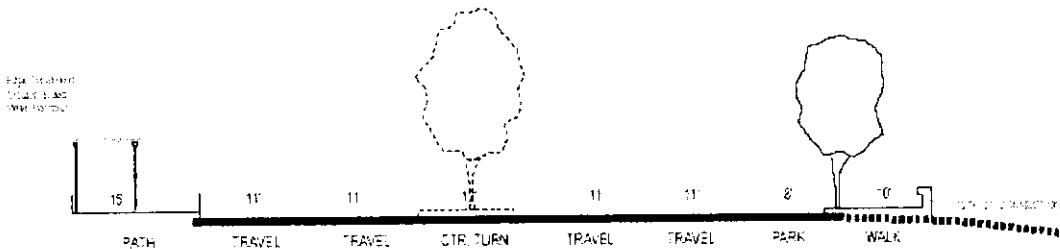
Cross-Section 100 Feet South of 12th Street, Looking North
